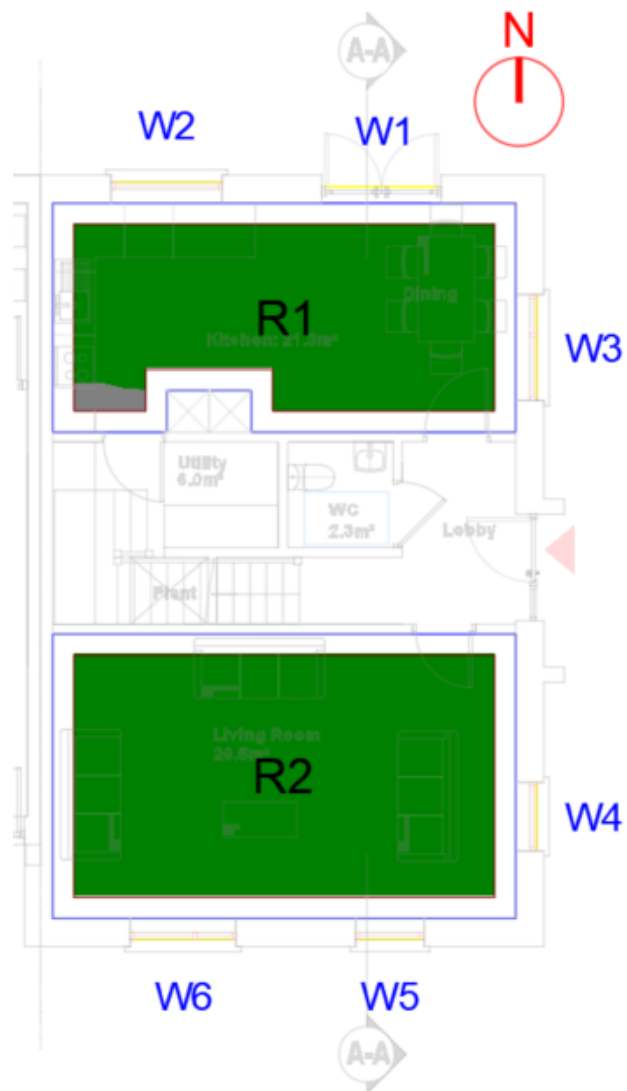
Proposed Ground Floor sDA Contours of House B-02 2-056
